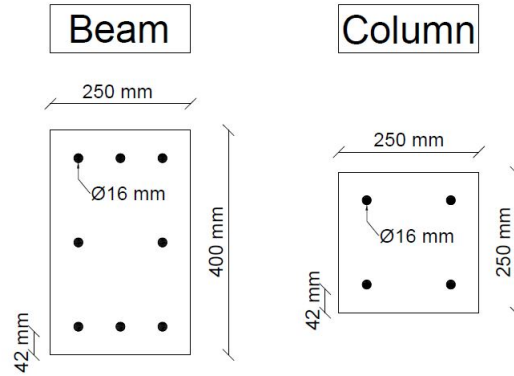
Illustration of the section properties for the beams and columns of the frame structure model.
